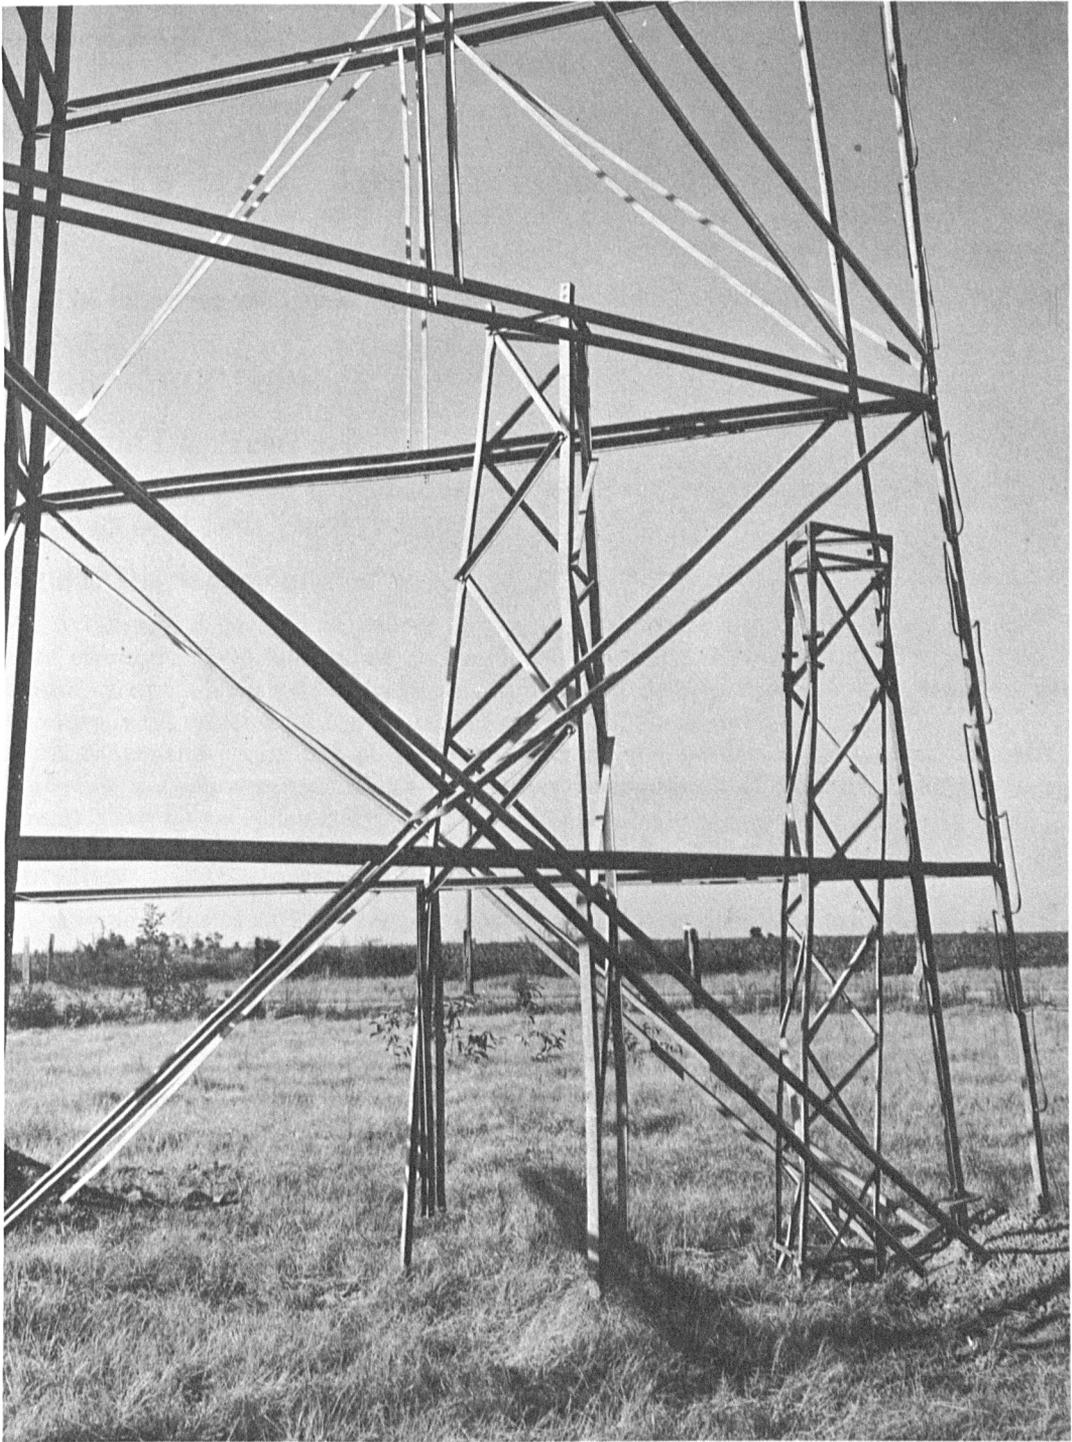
Built-up and welded sections prior to erection on tower.
